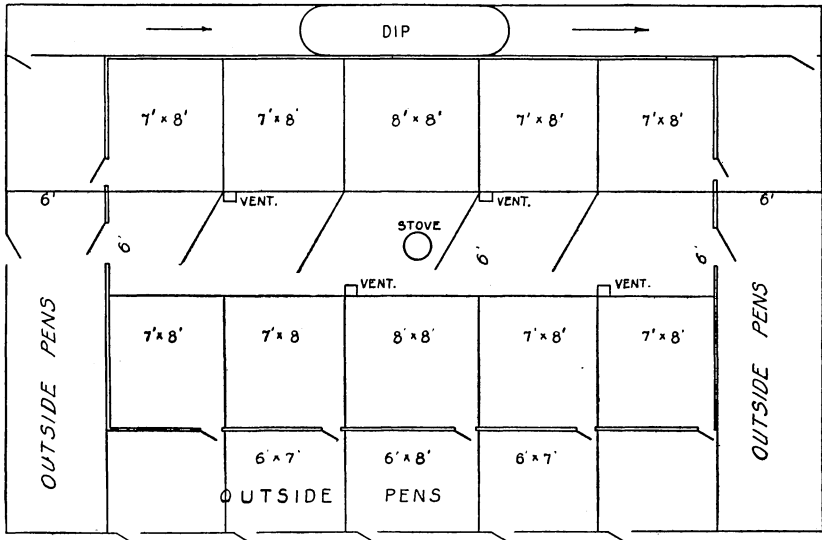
Ground plan of house shown in figure 9, showing arrangement of inside and outside pens, etc.
